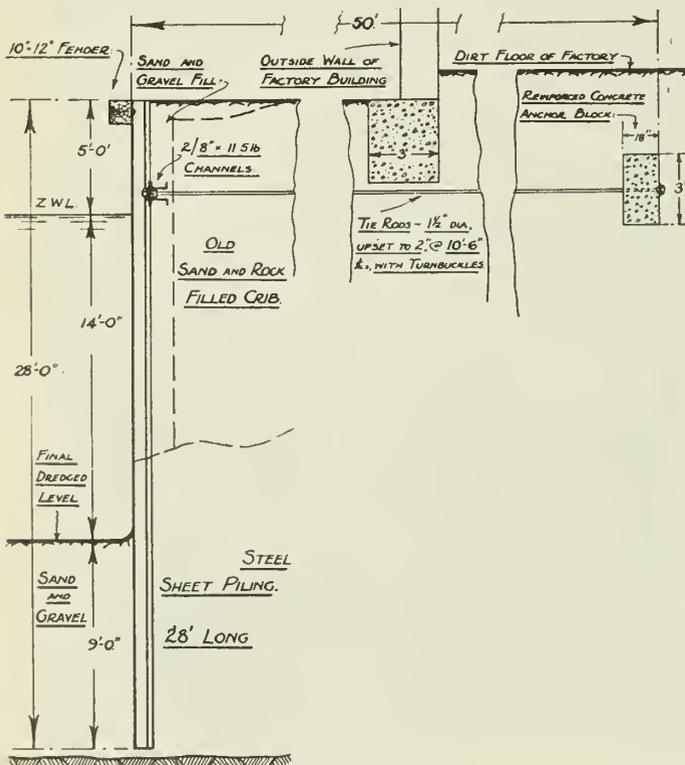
Reconstructed Wharf Wall, Port Hope Harbour.
